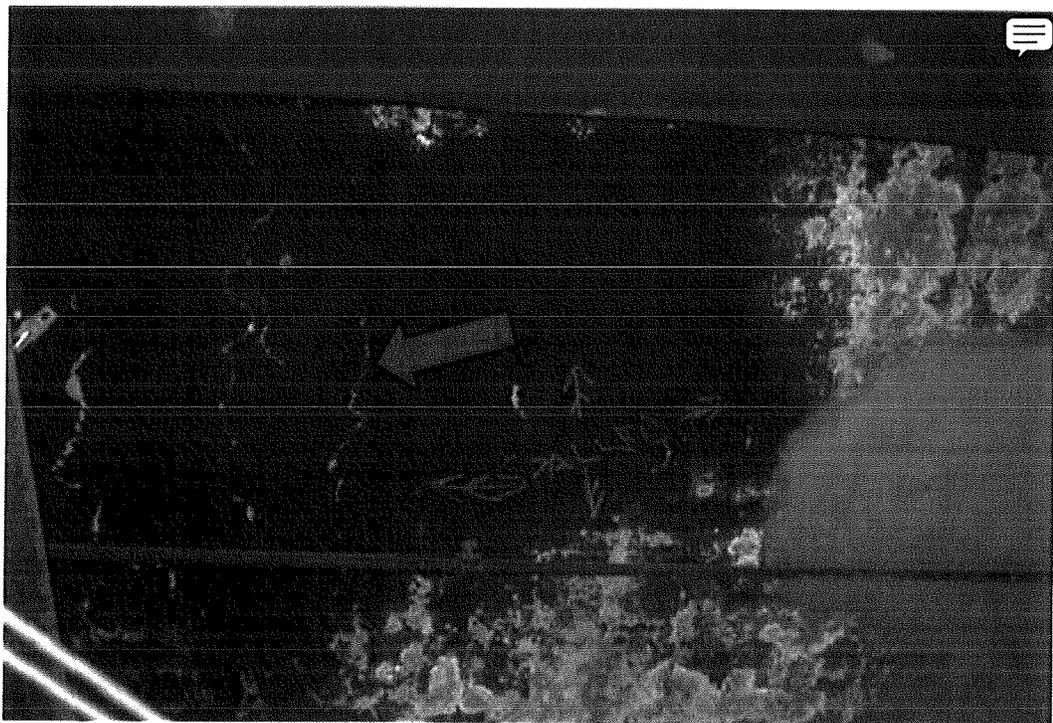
Cracked and hollow sounding concrete slab at the underside of the Fourth Floor. Between Column Lines 6/7 and K/L. (Approx. 225 SF)
